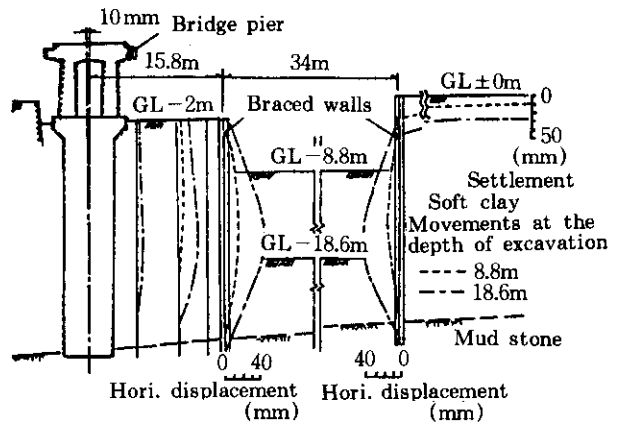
Movements of Ground, Bridge Pier and Braced Walls Caused by Deep Excavation.
